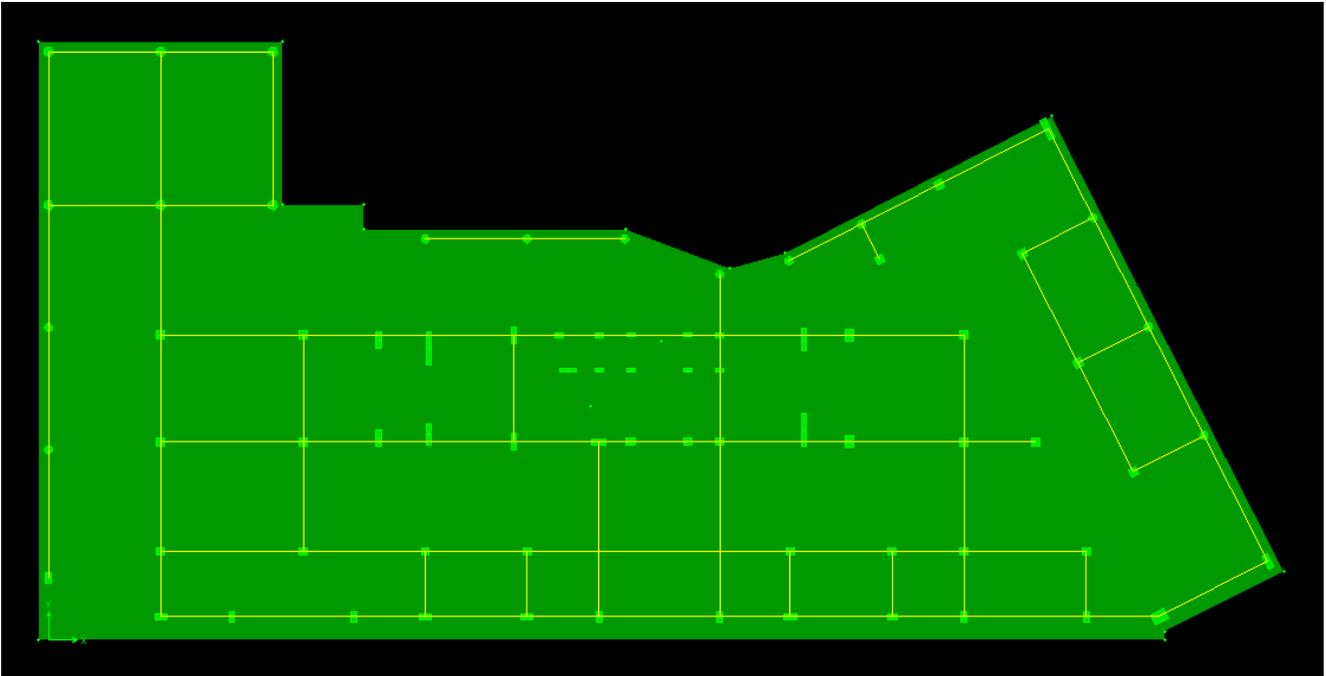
Plan view of the rigid floor diaphragm (green) and moment frame locations (yellow lines)
